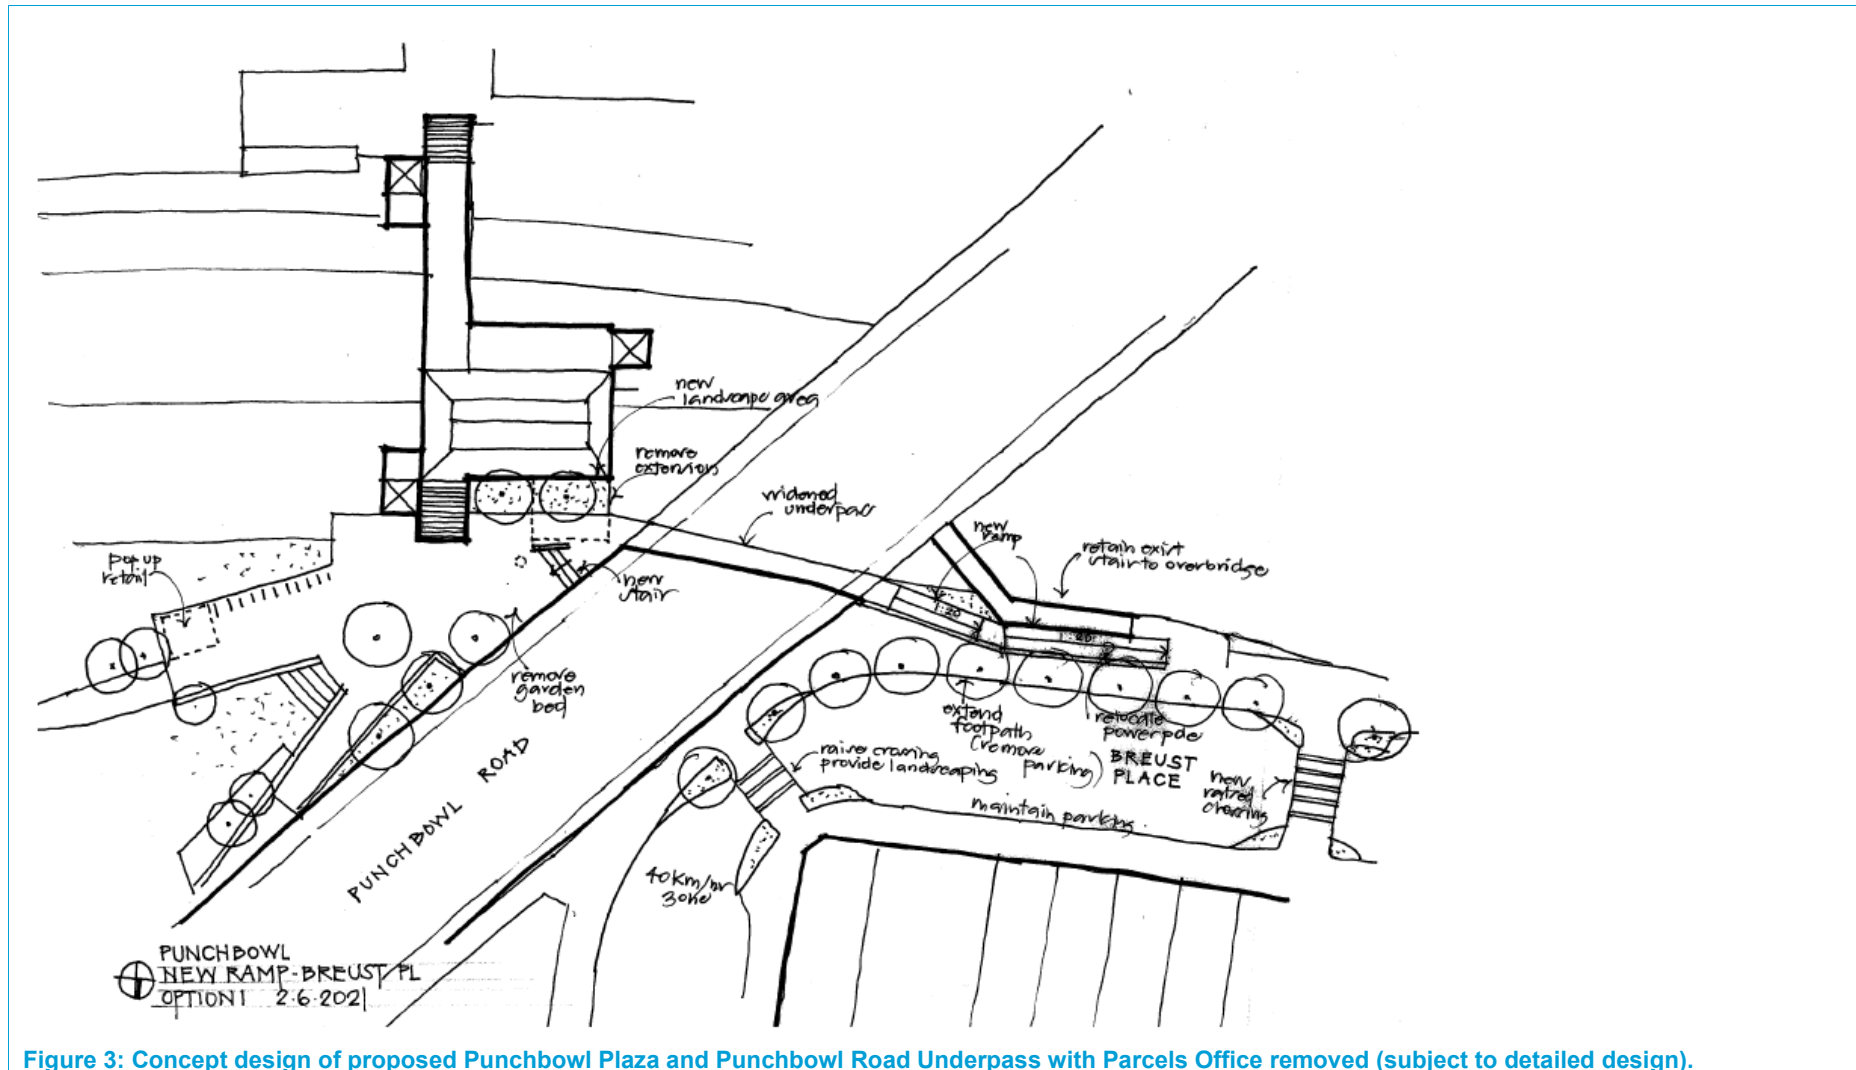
Concept design of proposed Punchbowl Plaza and Punchbowl Road Underpass with Parcels Office removed (subject to detailed design).
